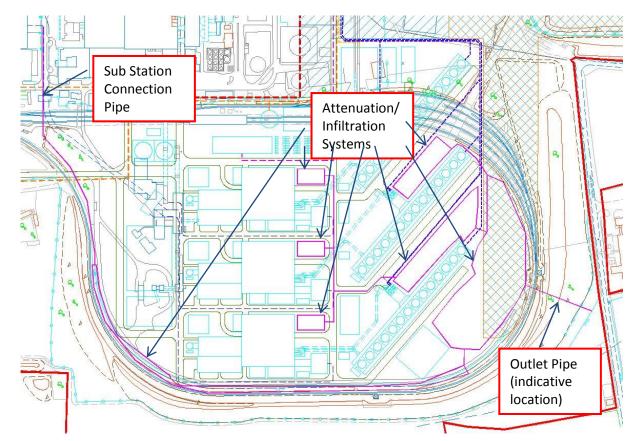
Sketch of Proposed Strategy for Proposed CCGT Area
